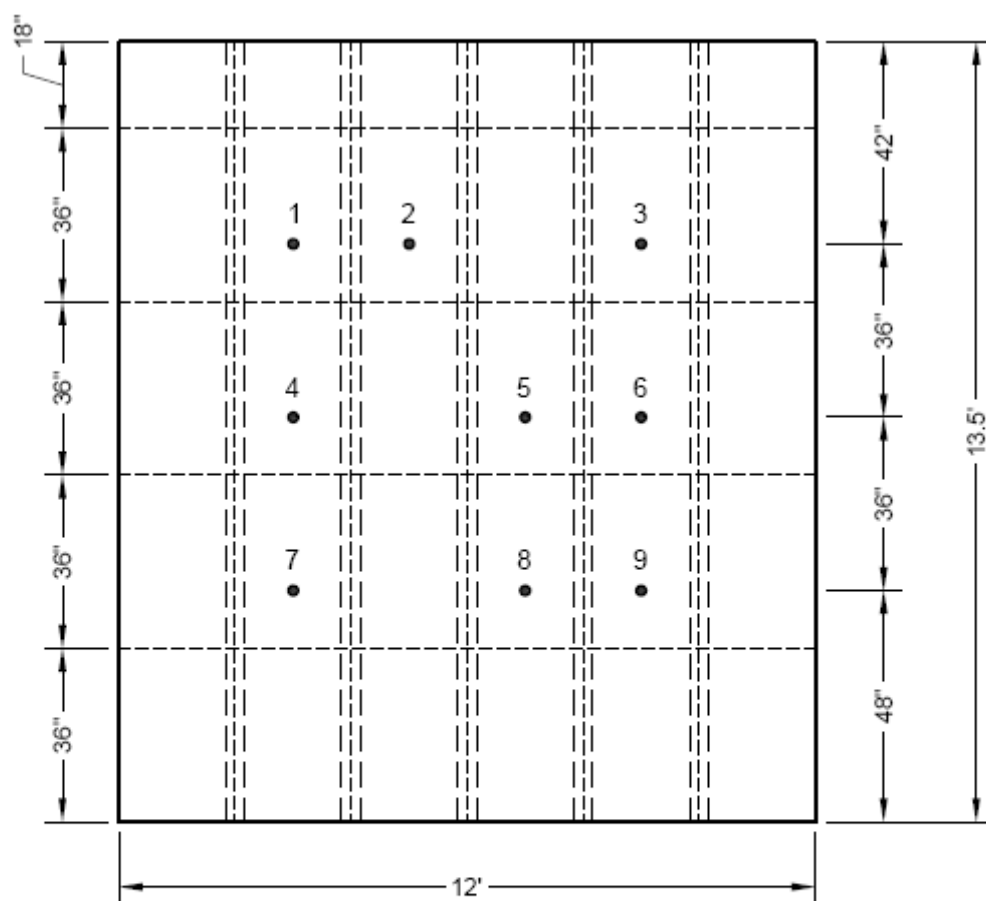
Deck assembly (reflected ceiling plan, stiffener face).
